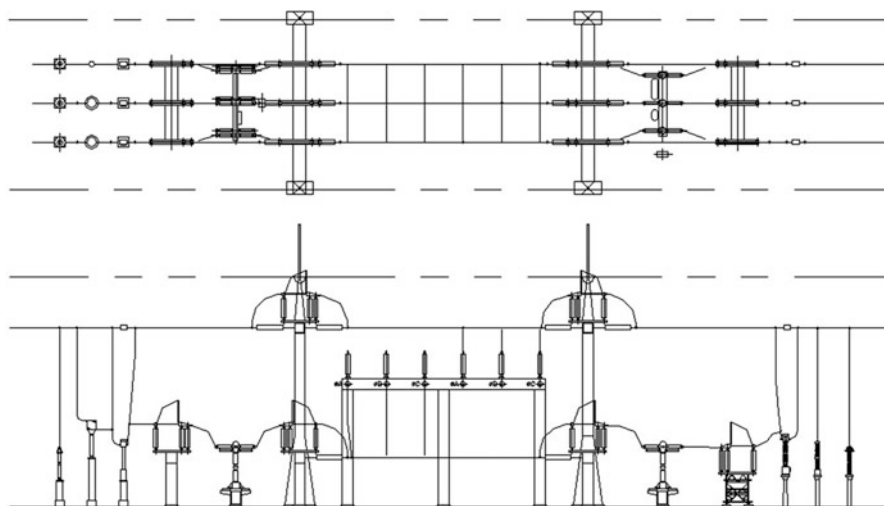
Busbar with flexible conductors: plan and elevation drawing
